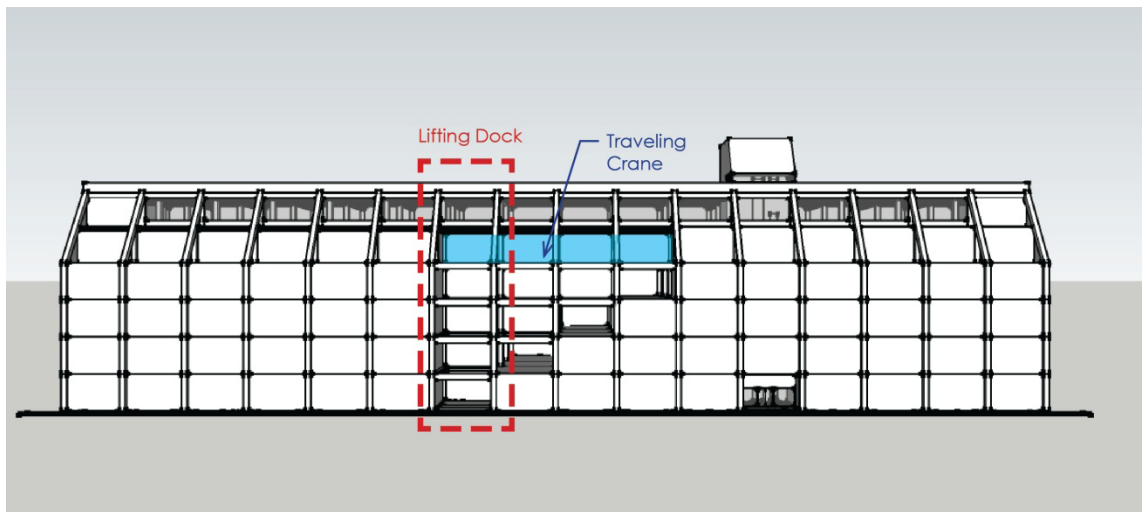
Massing Model of Existing Building – Waimanu Street Elevation²⁴⁰
